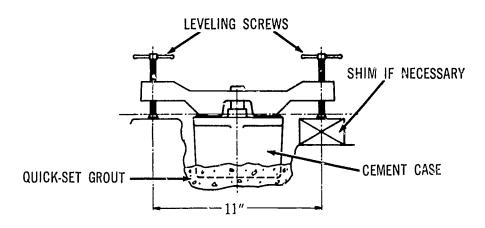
Setup of Rixson "Checkspotter" fixture
